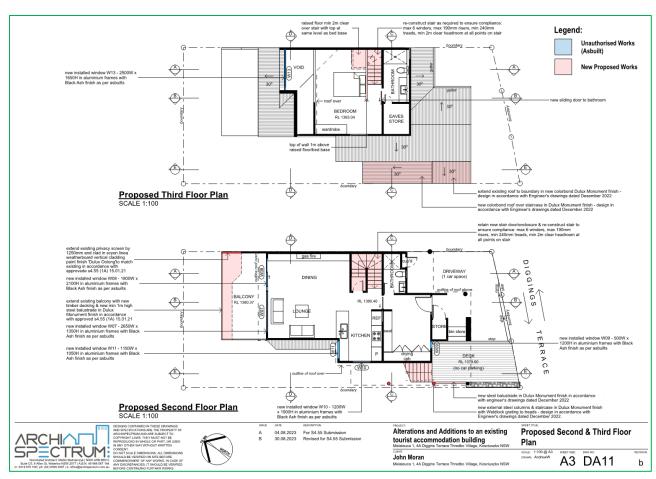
Second and Third floor plans of Diggings Terrace.
